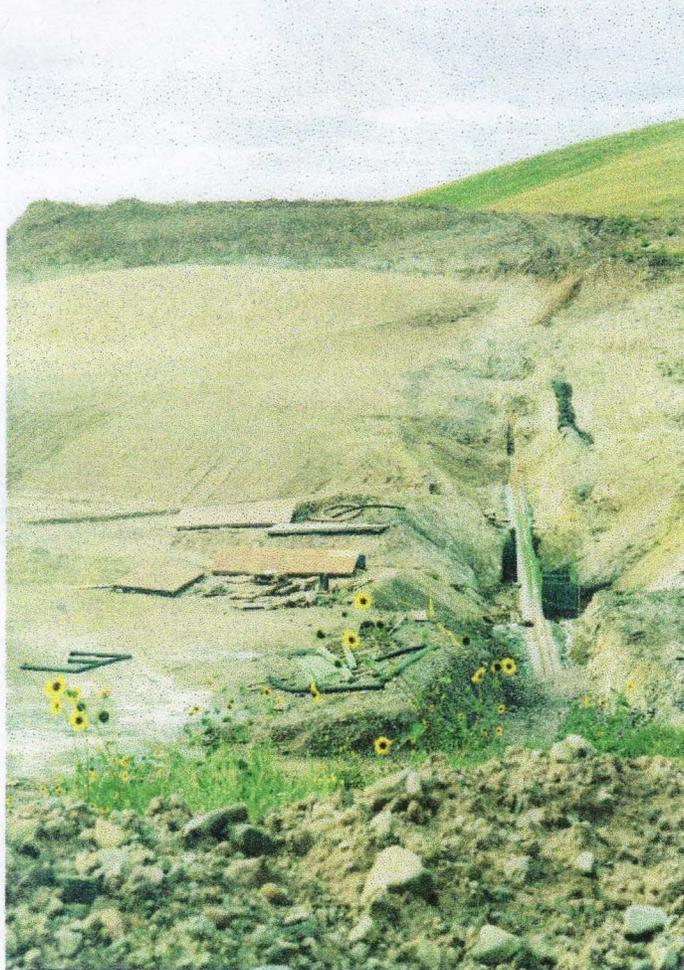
Construction of cutoff walls (underground dams) to trap the water flowing from the waste rock dumps into the alluvium in the gulches.
